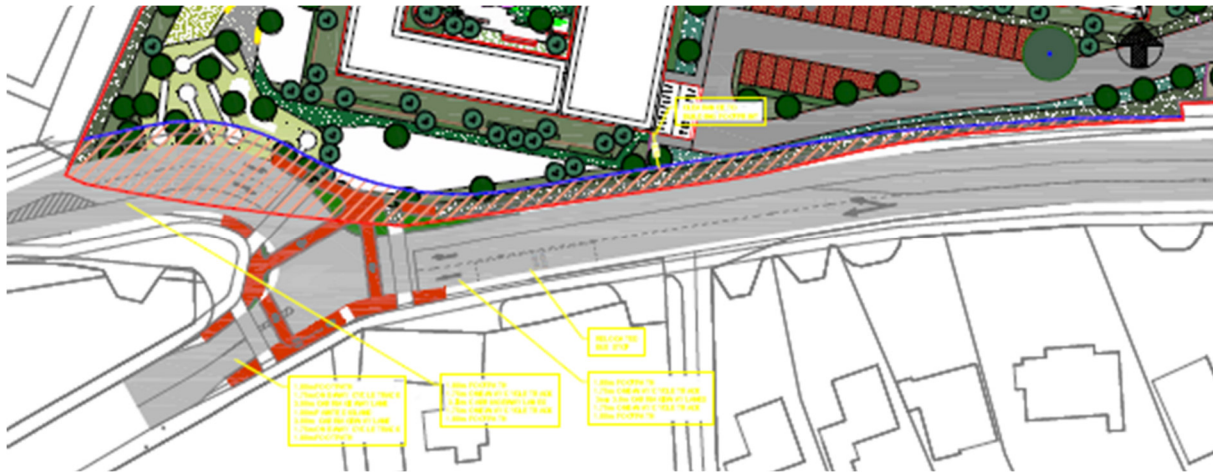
PROPOSED IMPROVEMENT SCHEME FOR CHAPEL HILL / LUCAN ROAD JUNCTION (JUNCTION 7)
